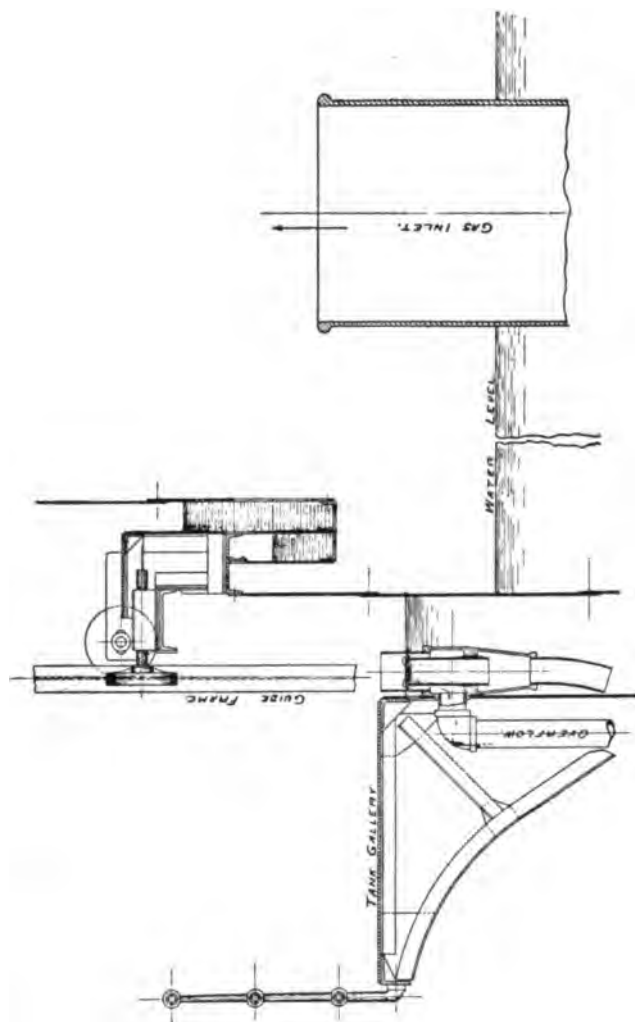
CROSS SECTION SHOWING THE HYDRAULIC SEAL BETWEEN TWO OUTER SECTIONS.
